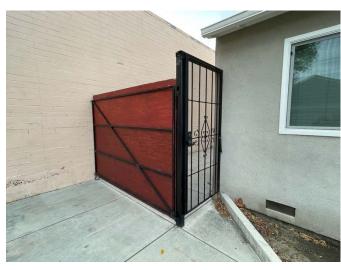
Driveway gate and security door at southwest corner of the rear elevation.
